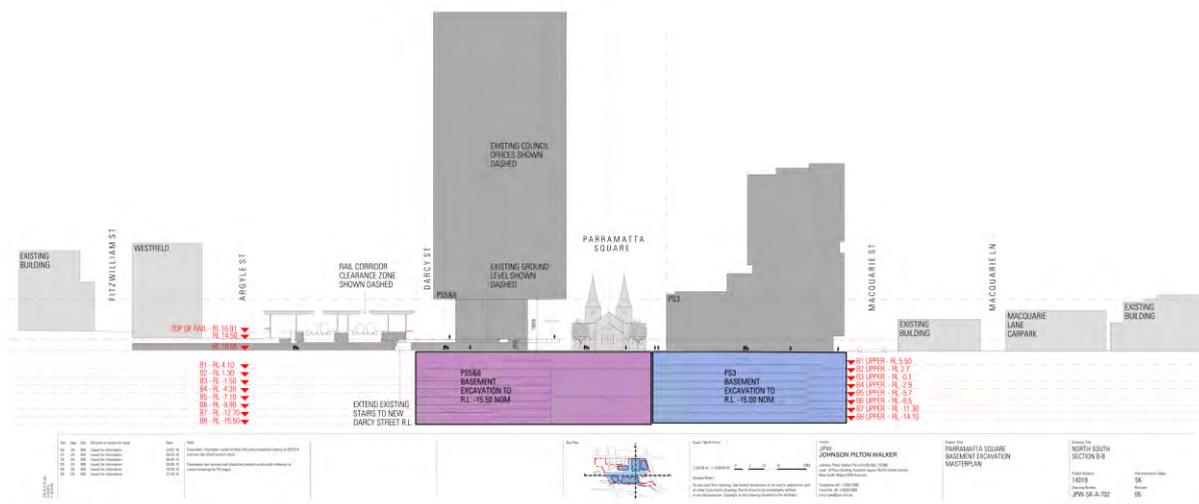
Elevation showing the below-ground basements, Parramatta Square Basement Excavation Masterplan, JPW, 31/03/2015.
